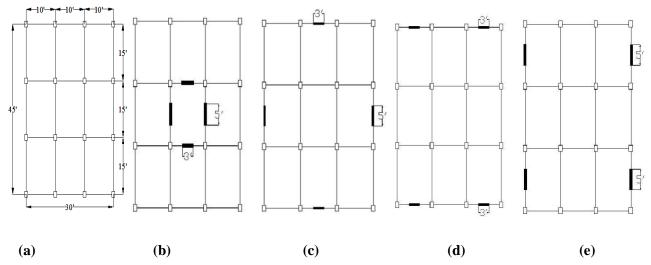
(a) Layout plan, (b) Structure with shear wall in both directions at inner section (Case 1), (c) Structure with shear wall in both directions at outer segment (Case 2), (d) Structure with Shear wall in short direction at outer segment (Case 3), (e) Structure with shear wall in long direction at outer segment (Case 4)
